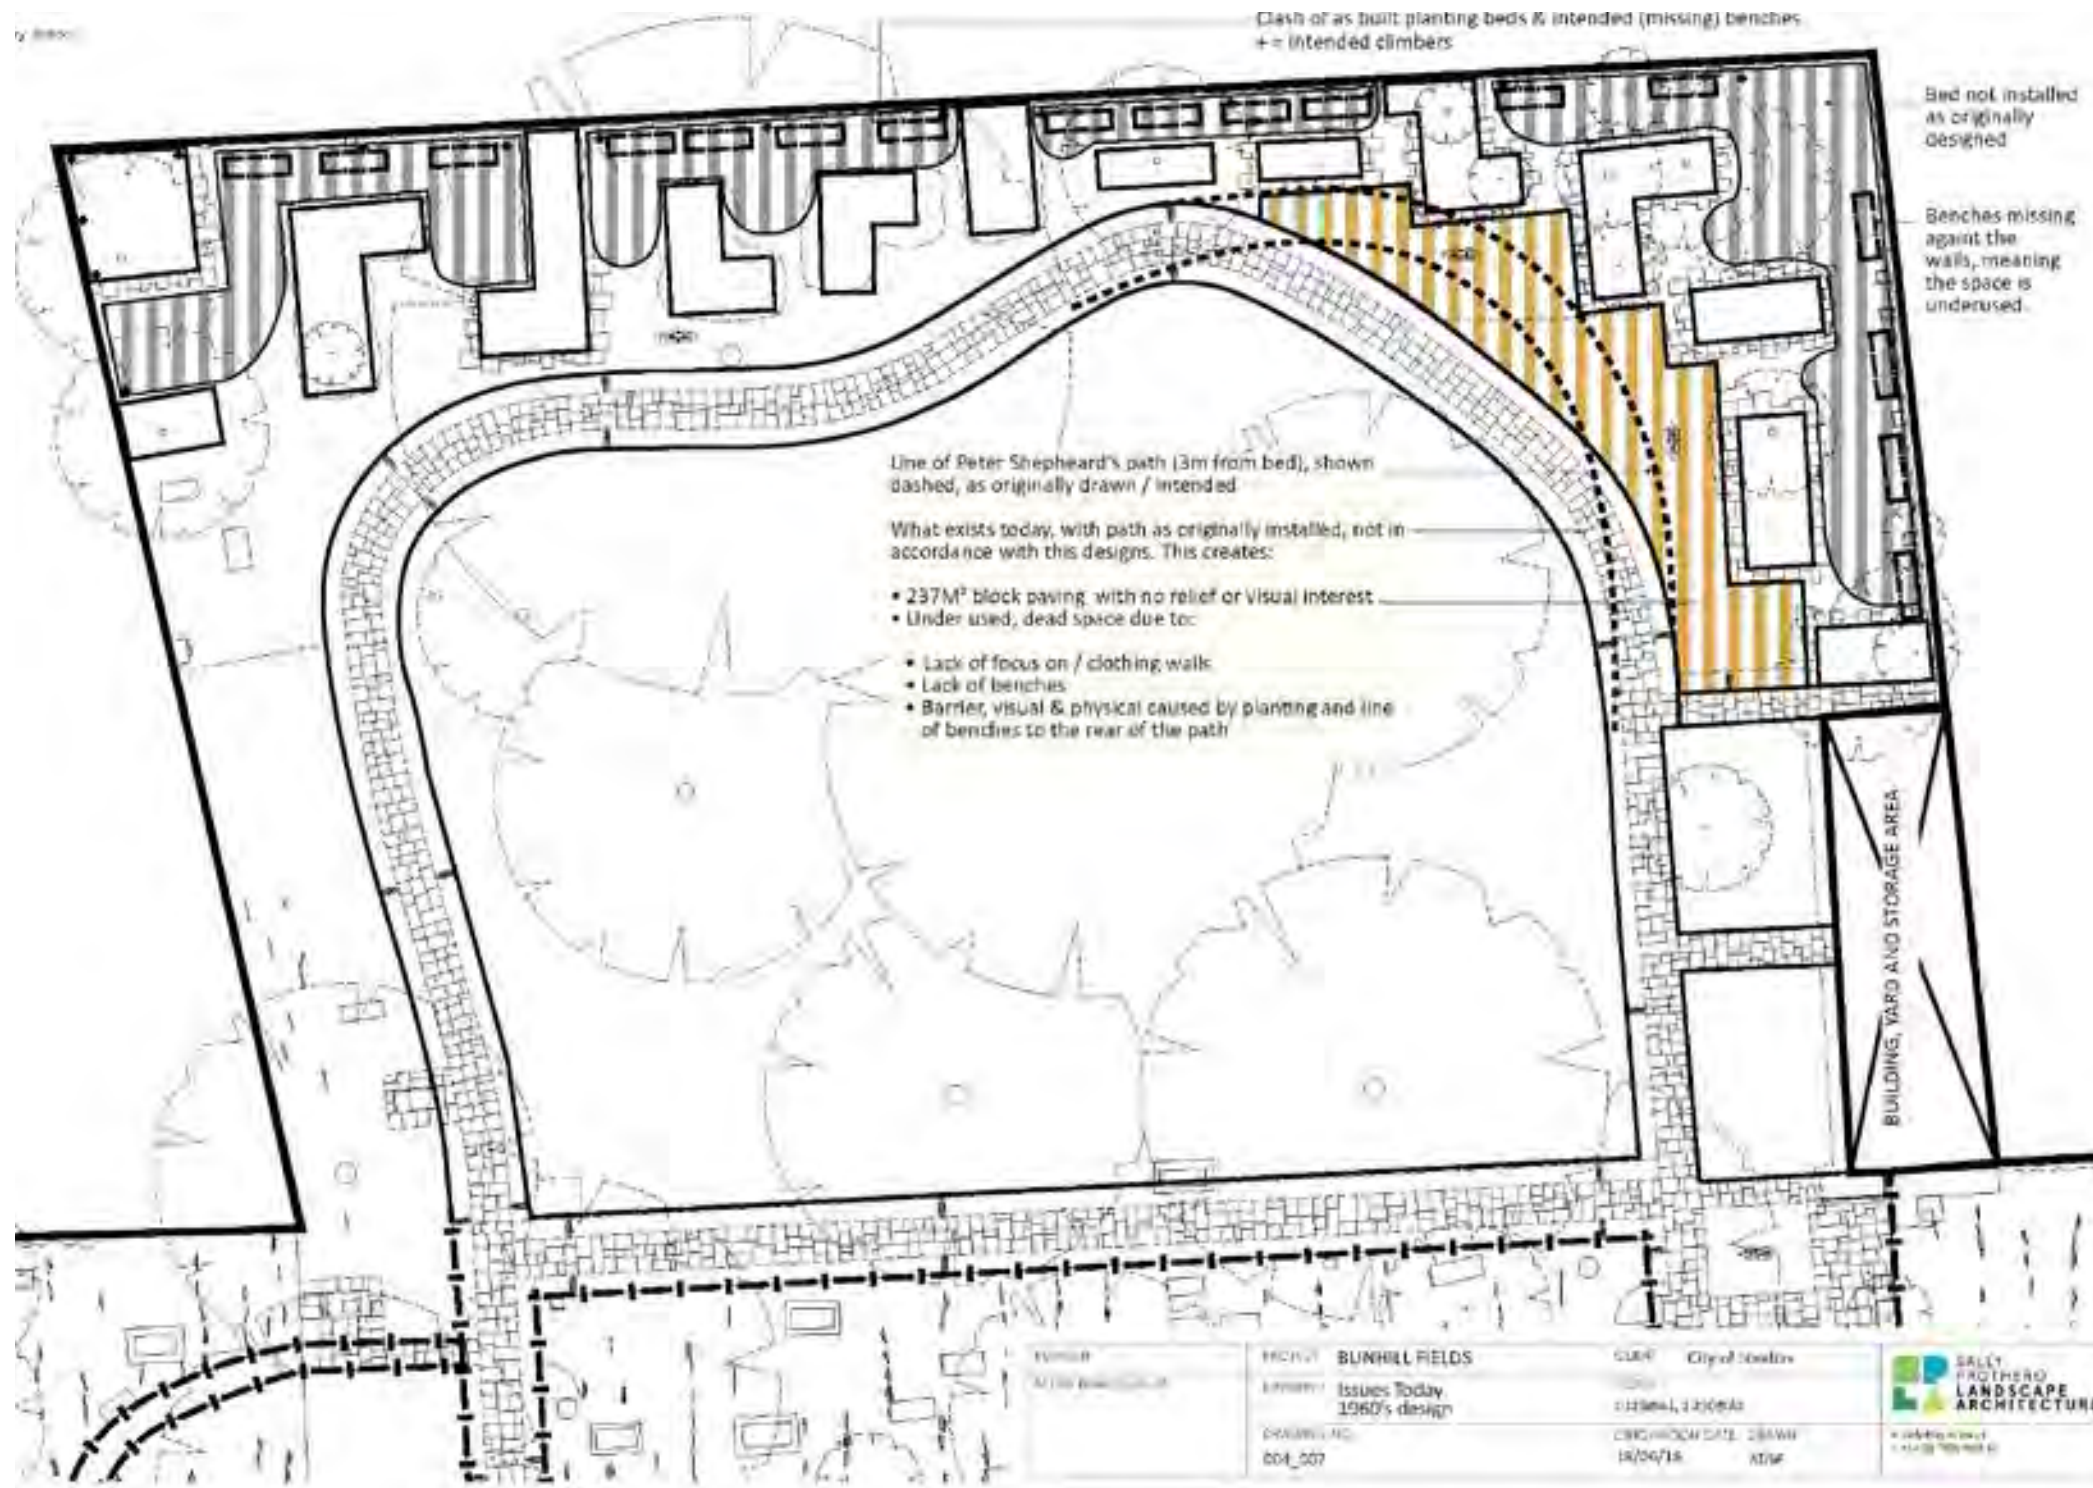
Peter Shephard's Intended Design Overlaid onto Current Site Plan
